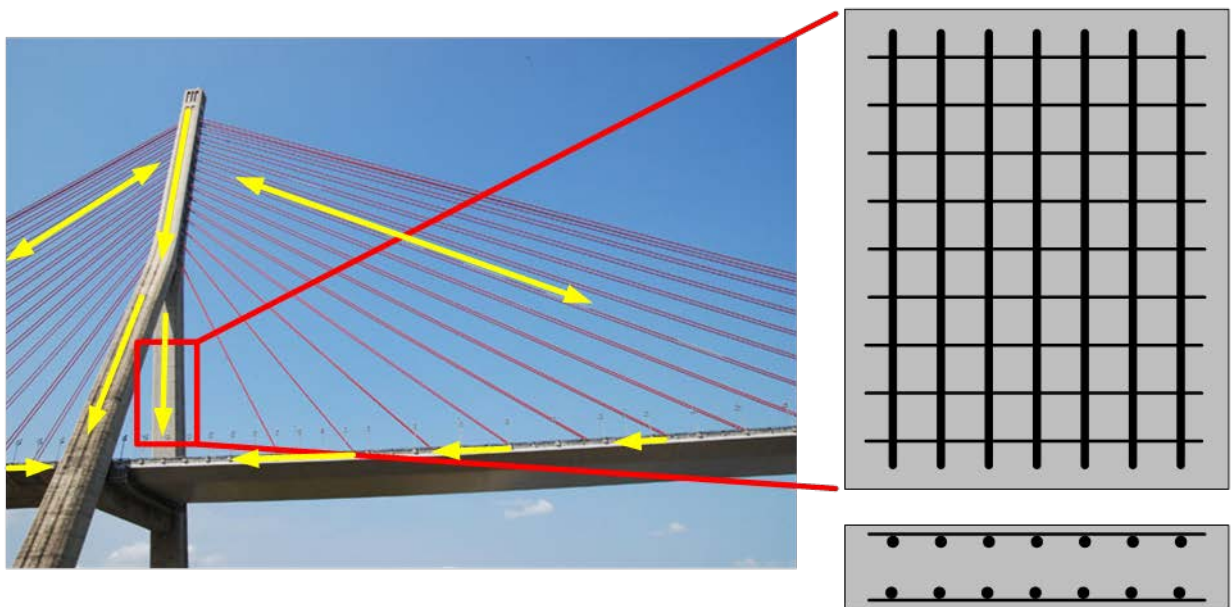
Illustrating Presence of Service-Level Axial Stress and Orthotropic Steel Reinforcing Configurations in Typical Cable-Stayed Bridge Towers (photo from [124])
